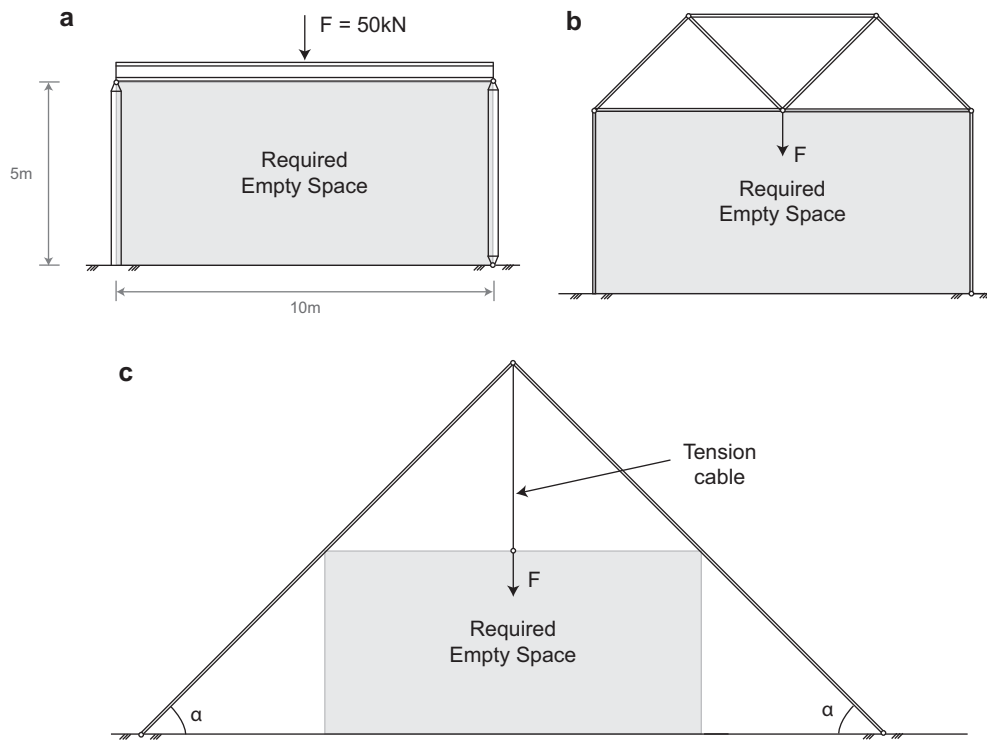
Structural demonstration of lightweight design principles for (a) conventional I-beam and (b, c) truss structures.
